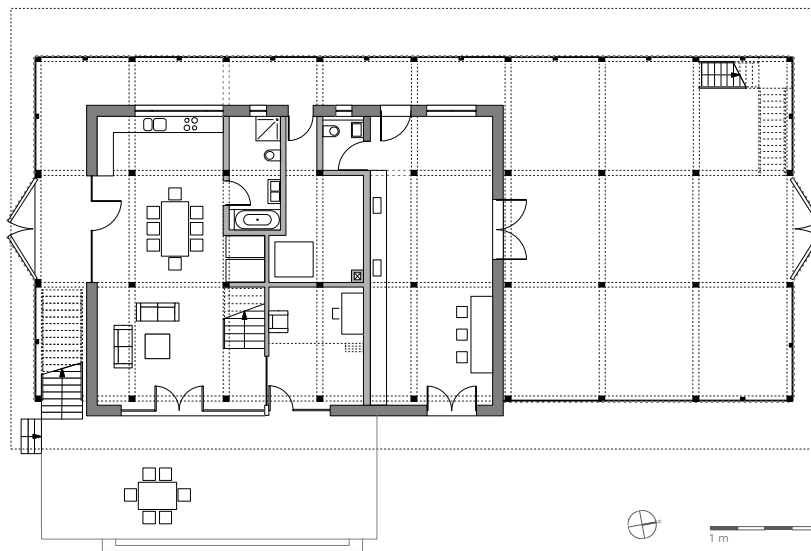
Ground floor plan showing house-in-house arrangement. Separate living and working areas in one building.
